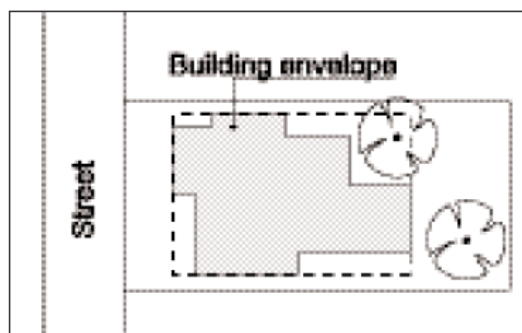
The building footprint fits within the front, side and rear setback requirements; the footprint shape responds to site features, privacy, solar access and outdoor space design principles.
